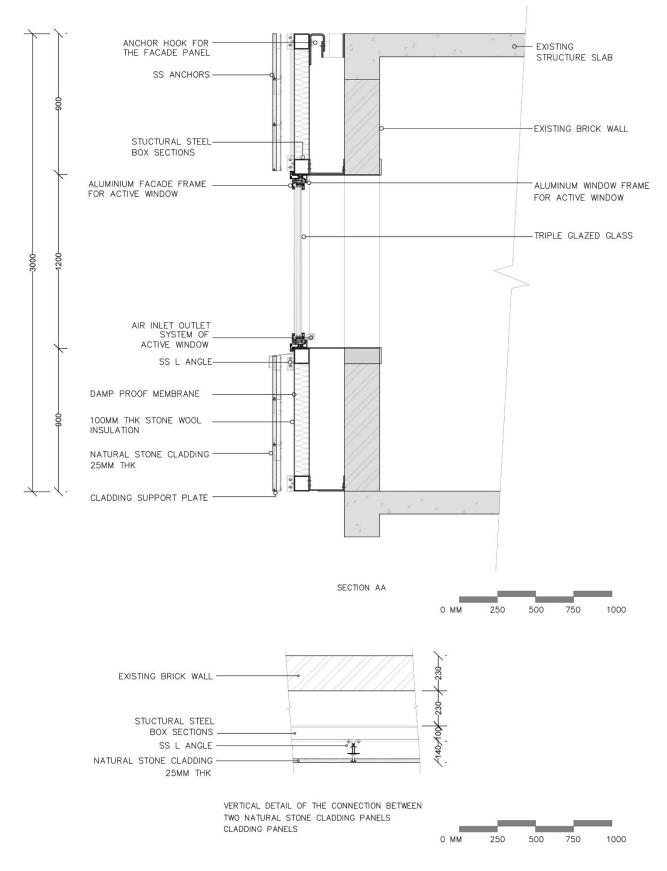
Section of Panel B and Details by author for representation purpose only Details modified from Façade construction manual (Herzog, T., Krippner, R., & Lang, W. (2017))
